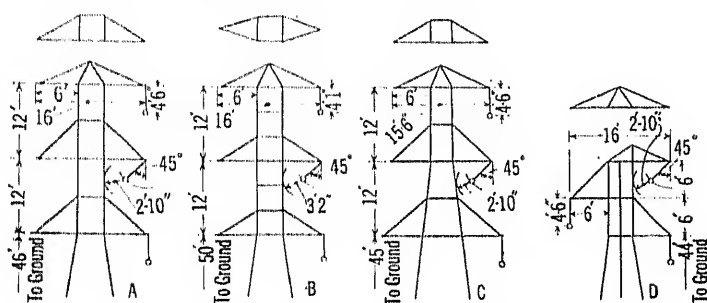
TYPES OF TOWERS SHOWING DIMENSIONS AND CLEARANCES
